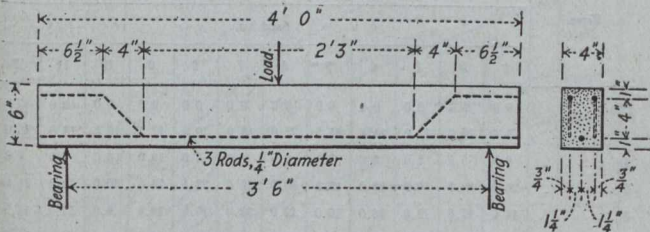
Details of Reinforced Concrete Beam Used in Tests
